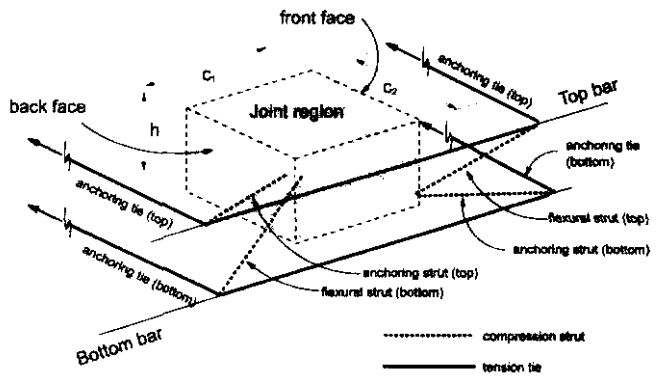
Strut-and-tie model for slab reinforcement outside of joint.
